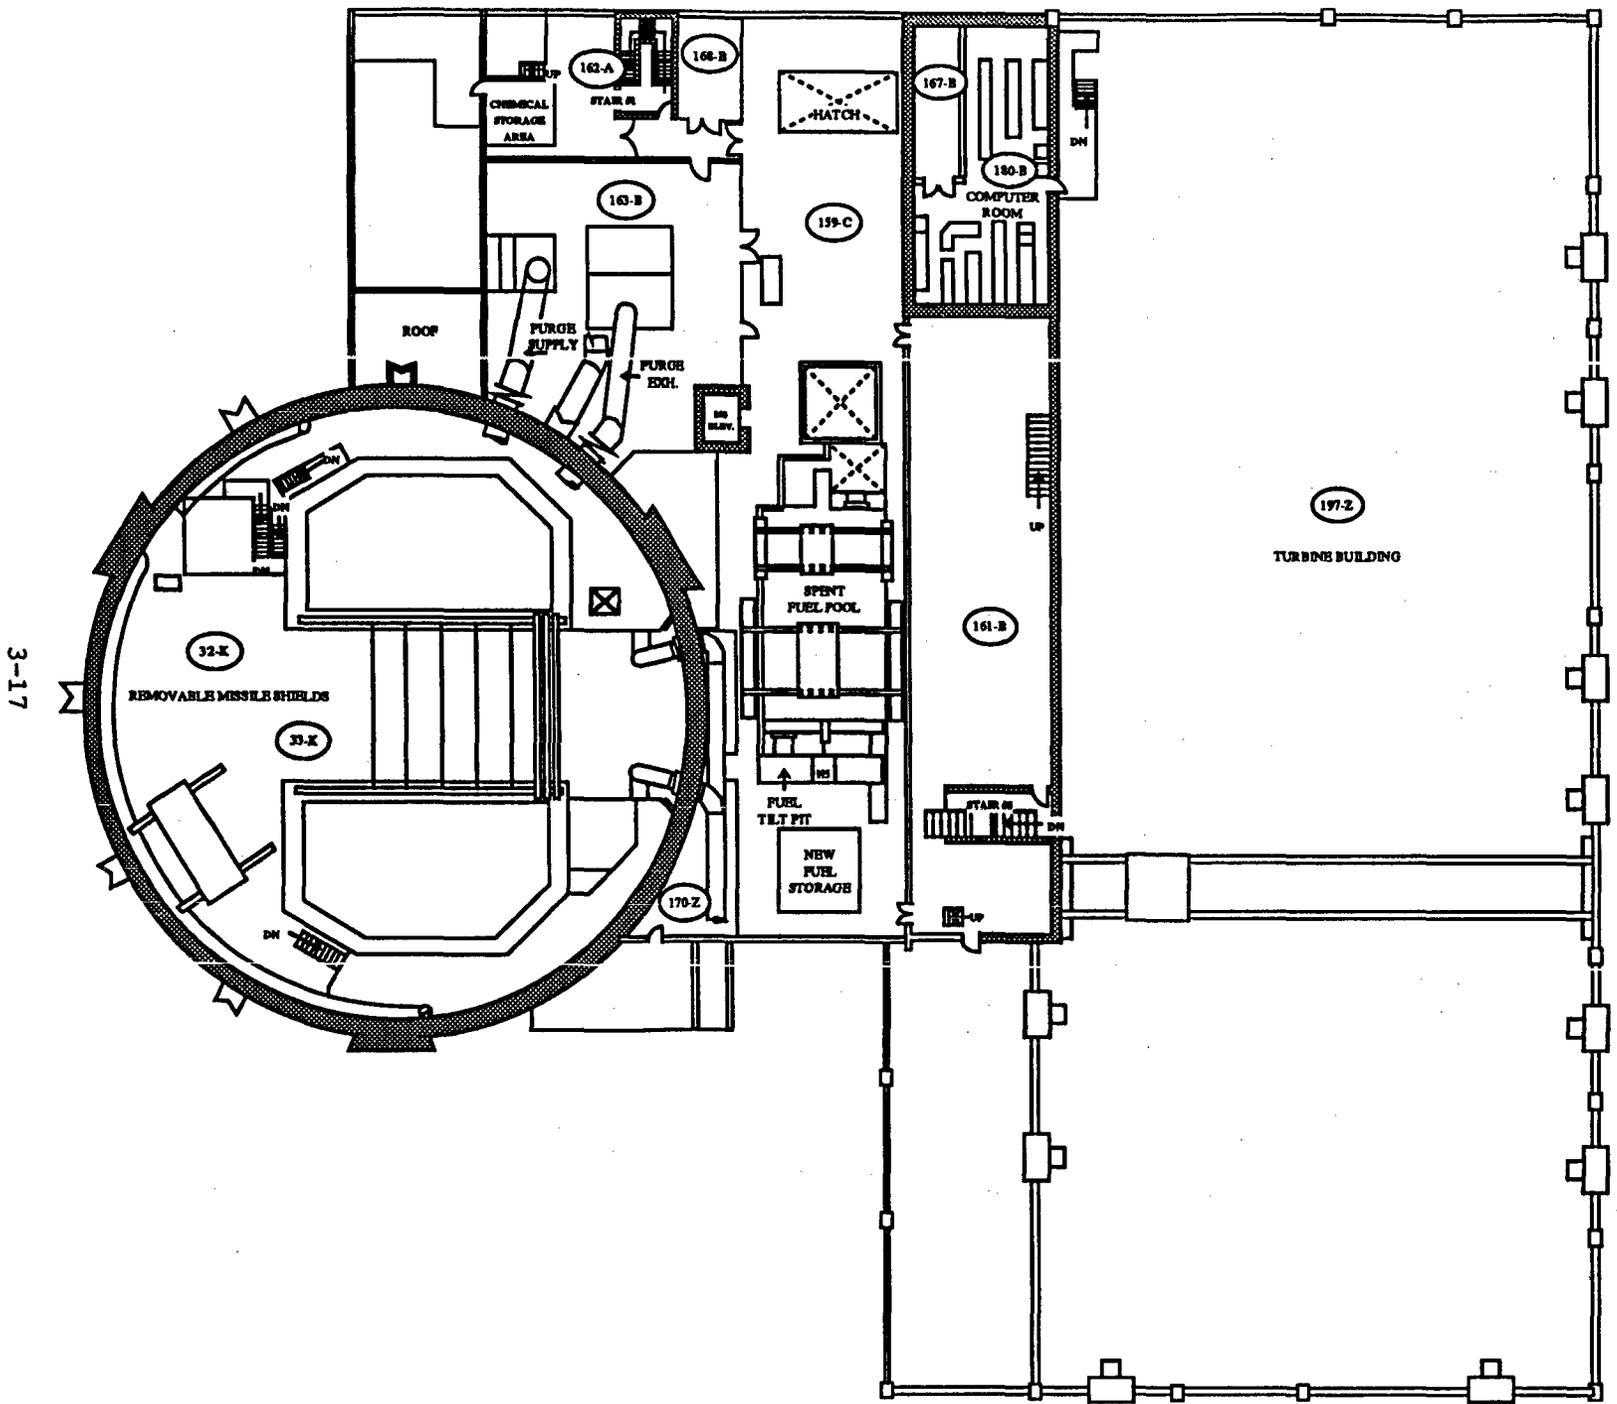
FIRE ZONES ON ELEVATION 404'
